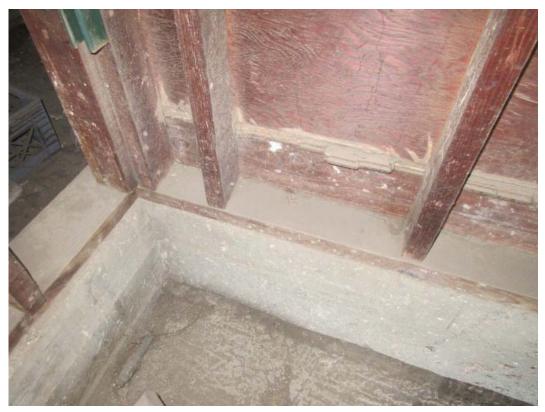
Close up of north and east wall sill plates with anchor bolts, plywood, and stud framing below rear stage platform.
